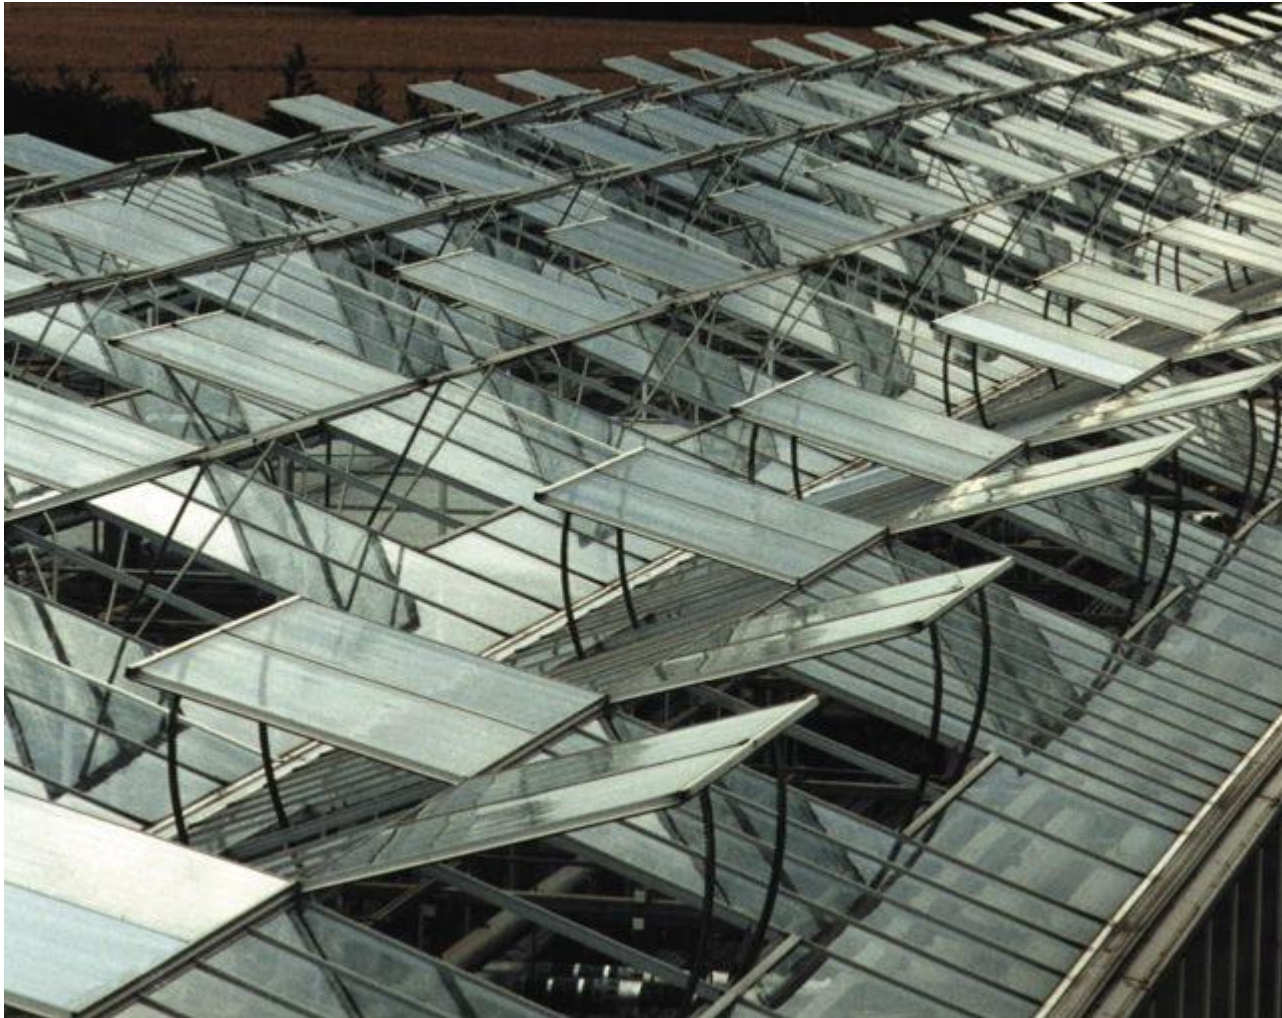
'Truss rail mechanism' for operation of ventilation windows in a Venlo-type greenhouse on top of the trellis girders
